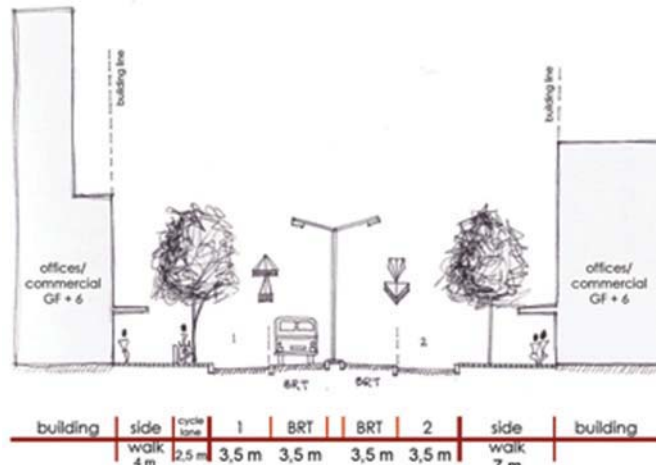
A section through the northern part of Paul Kruger Street depicting the character of the street
